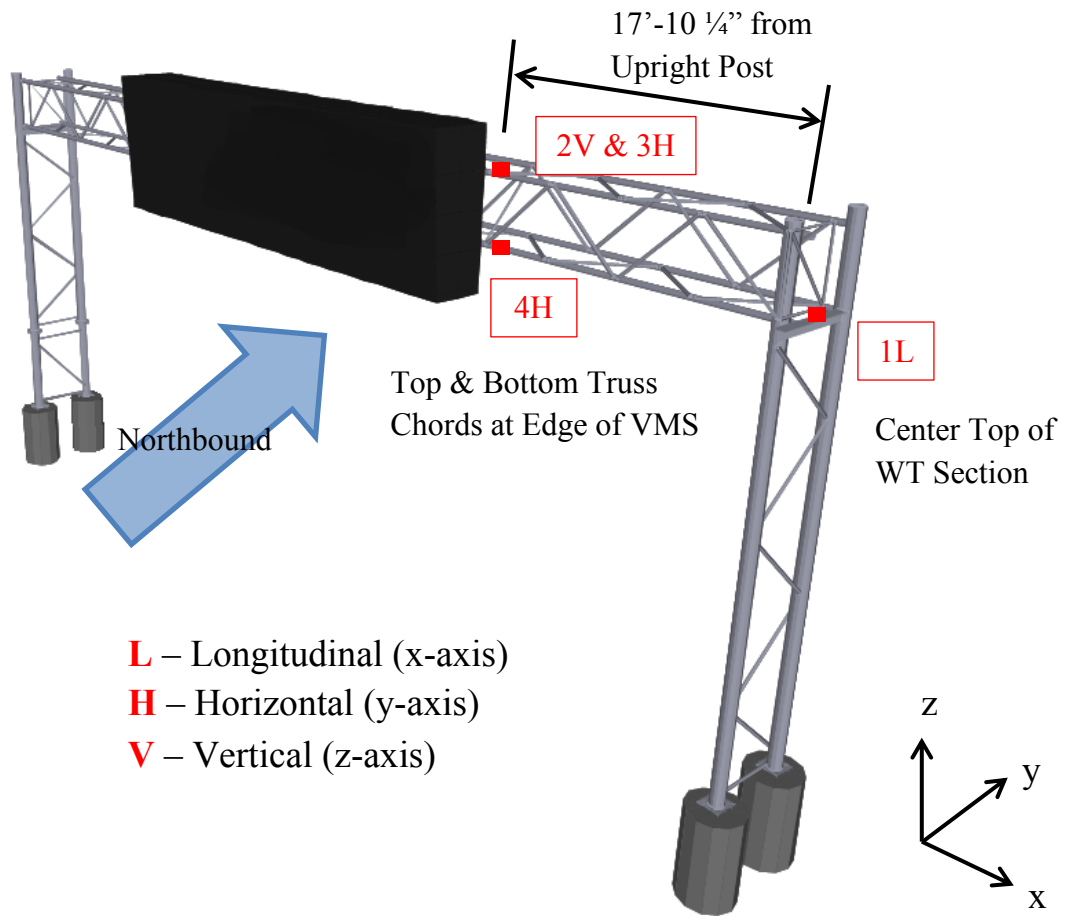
Accelerometer Placement on Truss Chords and WT Section (Adapted from Fouad 2011)
